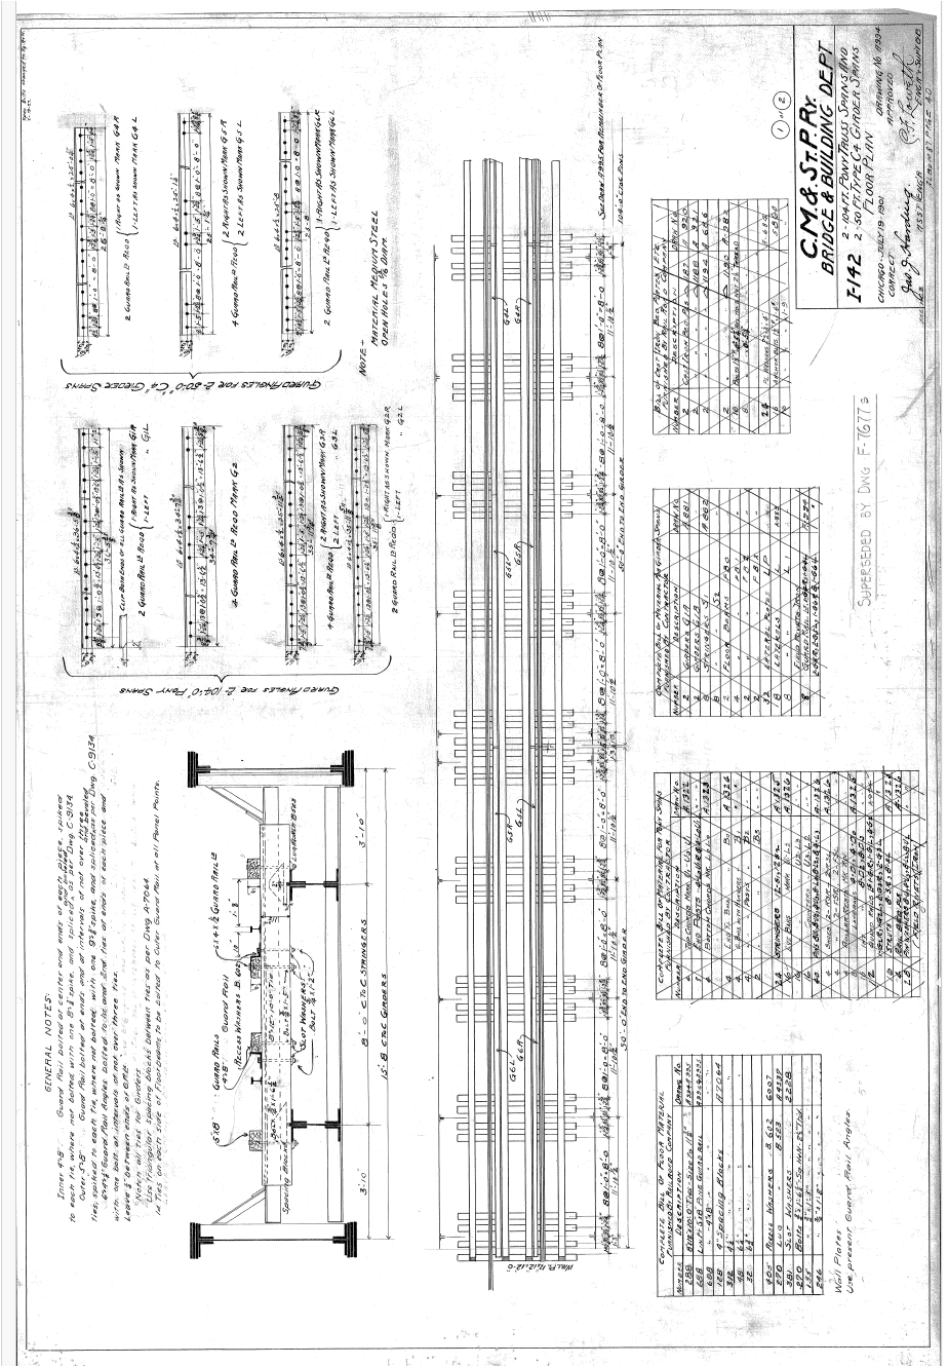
Copy of an original Bridge I-142 engineering construction plan. (Chicago, Milwaukee, and St. Paul Railway, Bridge and Building Department. I-142 2-104 ft Pony Truss Spans & 2-50 ft Type C4 Girder Spans, Floor Plan, Drawing no. A-995, Chicago, July 19, 1901. 1 of 2. Electronic copy provided by SW Bridge Engineers, LLC, De Forest, Wisconsin, May 2023.)
